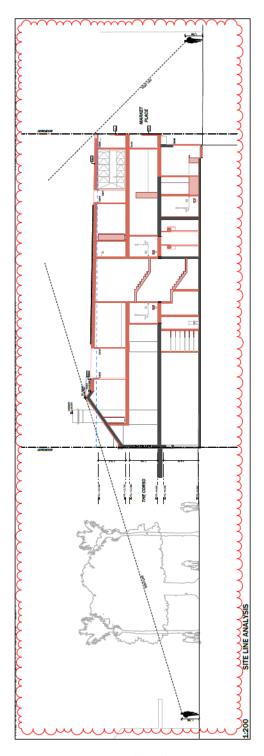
Site Line Diagram - Proposed height contravention not observable
